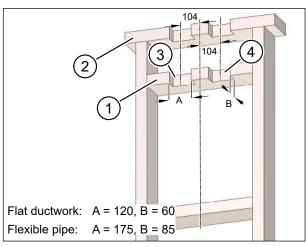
Sawing channels for flat ductwork or flexible pipes, dimensions in millimetres
